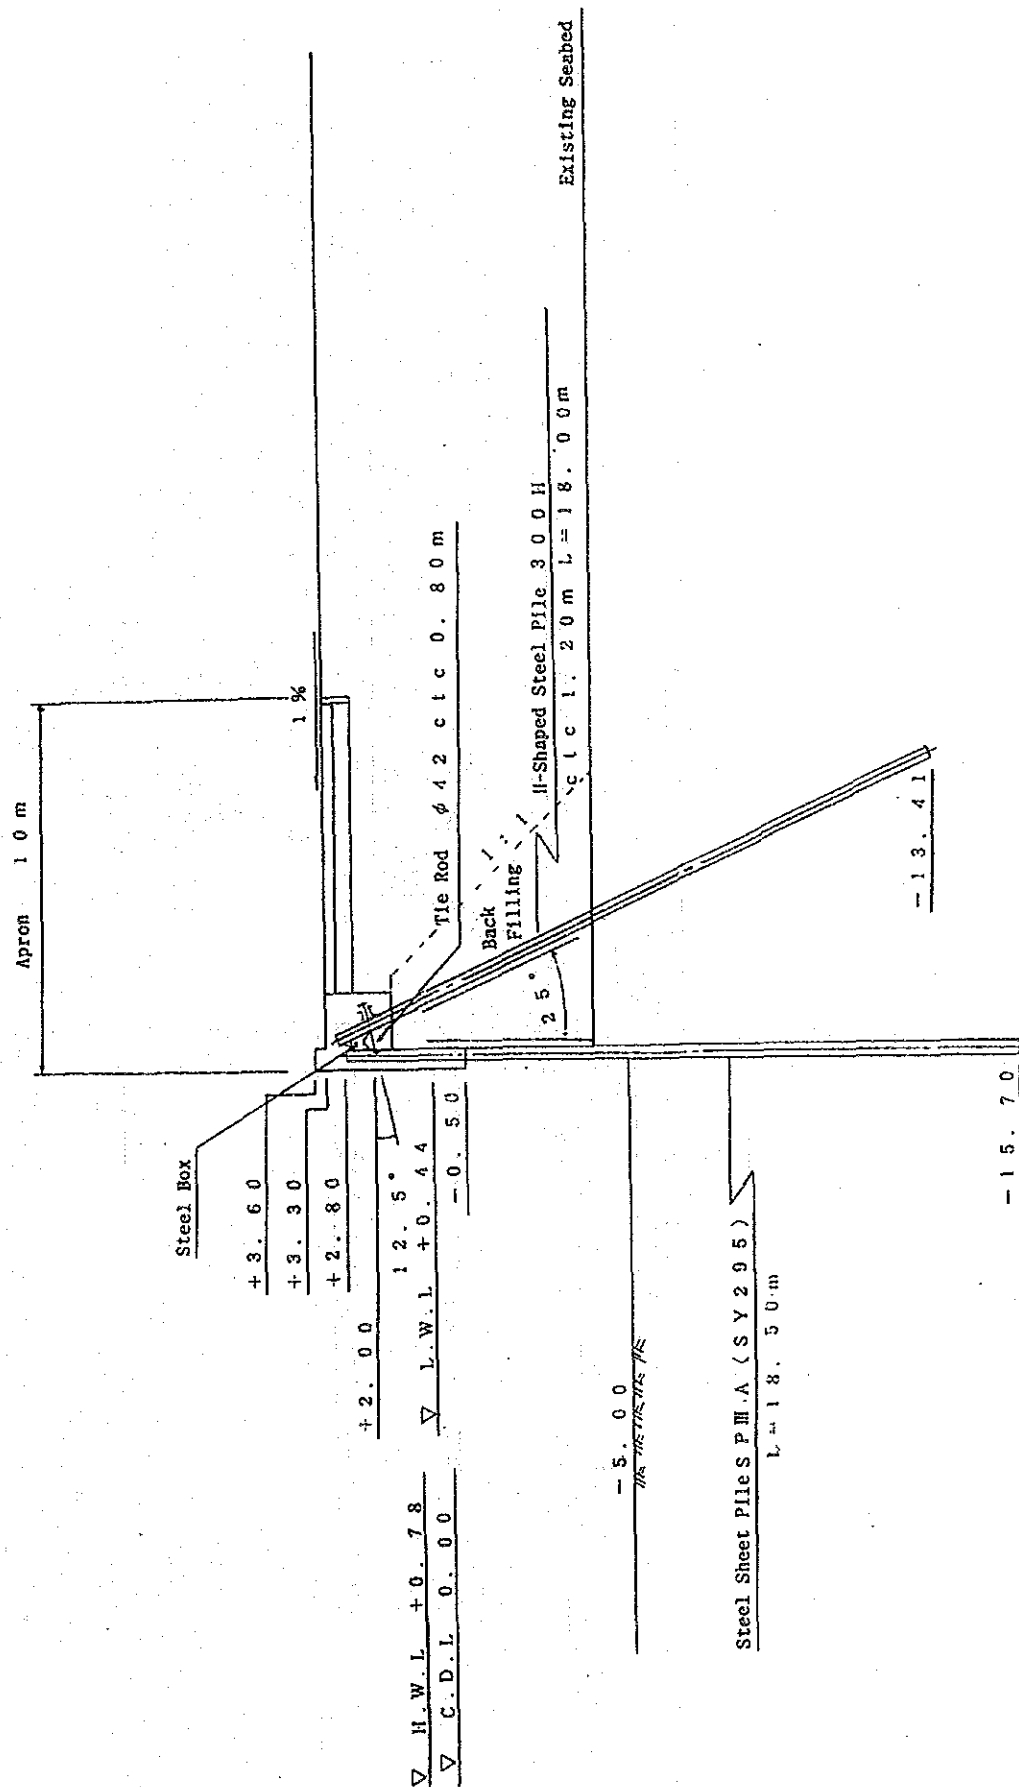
Typical Cross-section of Small Dock along North Return Wall
